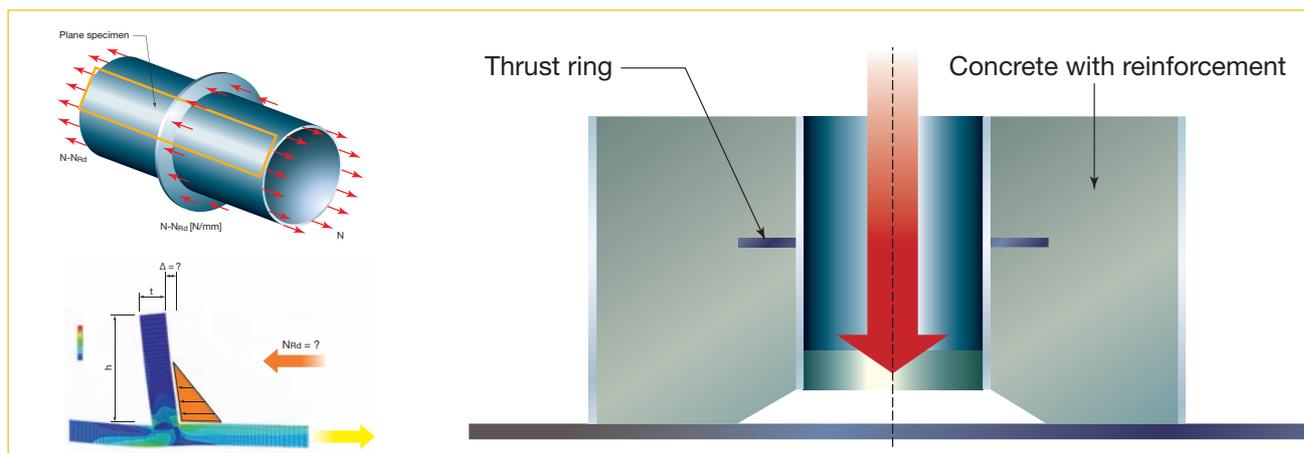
General models for testing – plane specimen (left) and cylindrical test arrangement (right)
